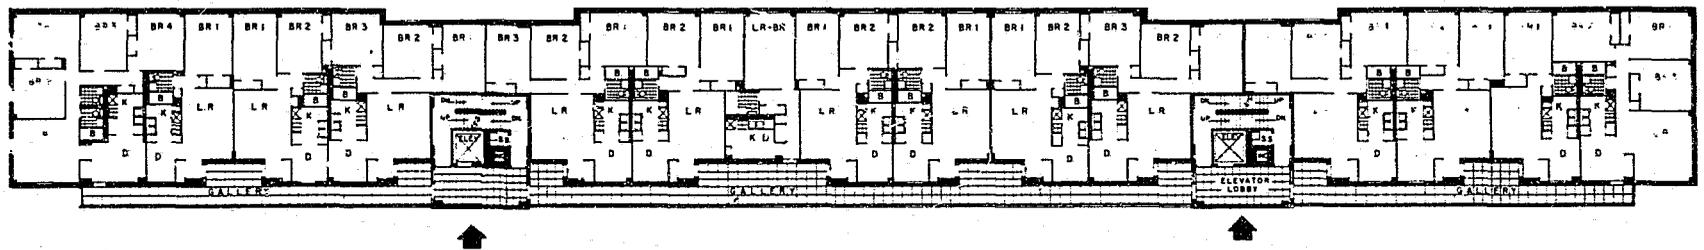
Stapleton Houses, New York. Floor plan. An example of single-loaded building design. Apartment unit entries are on only one side of the corridor. Living room and kitchen-dining room windows open onto the corridor providing good surveillance opportunities.
